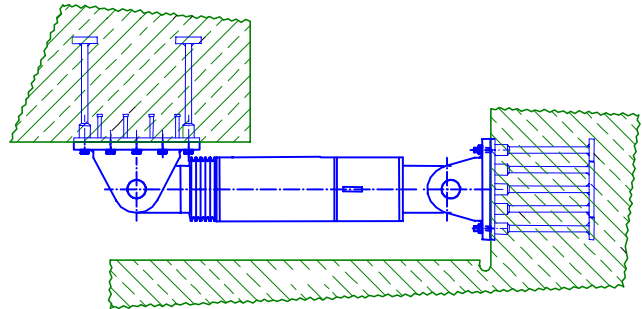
Alternative installation position of MSTU/MSTL mainly used for piers
